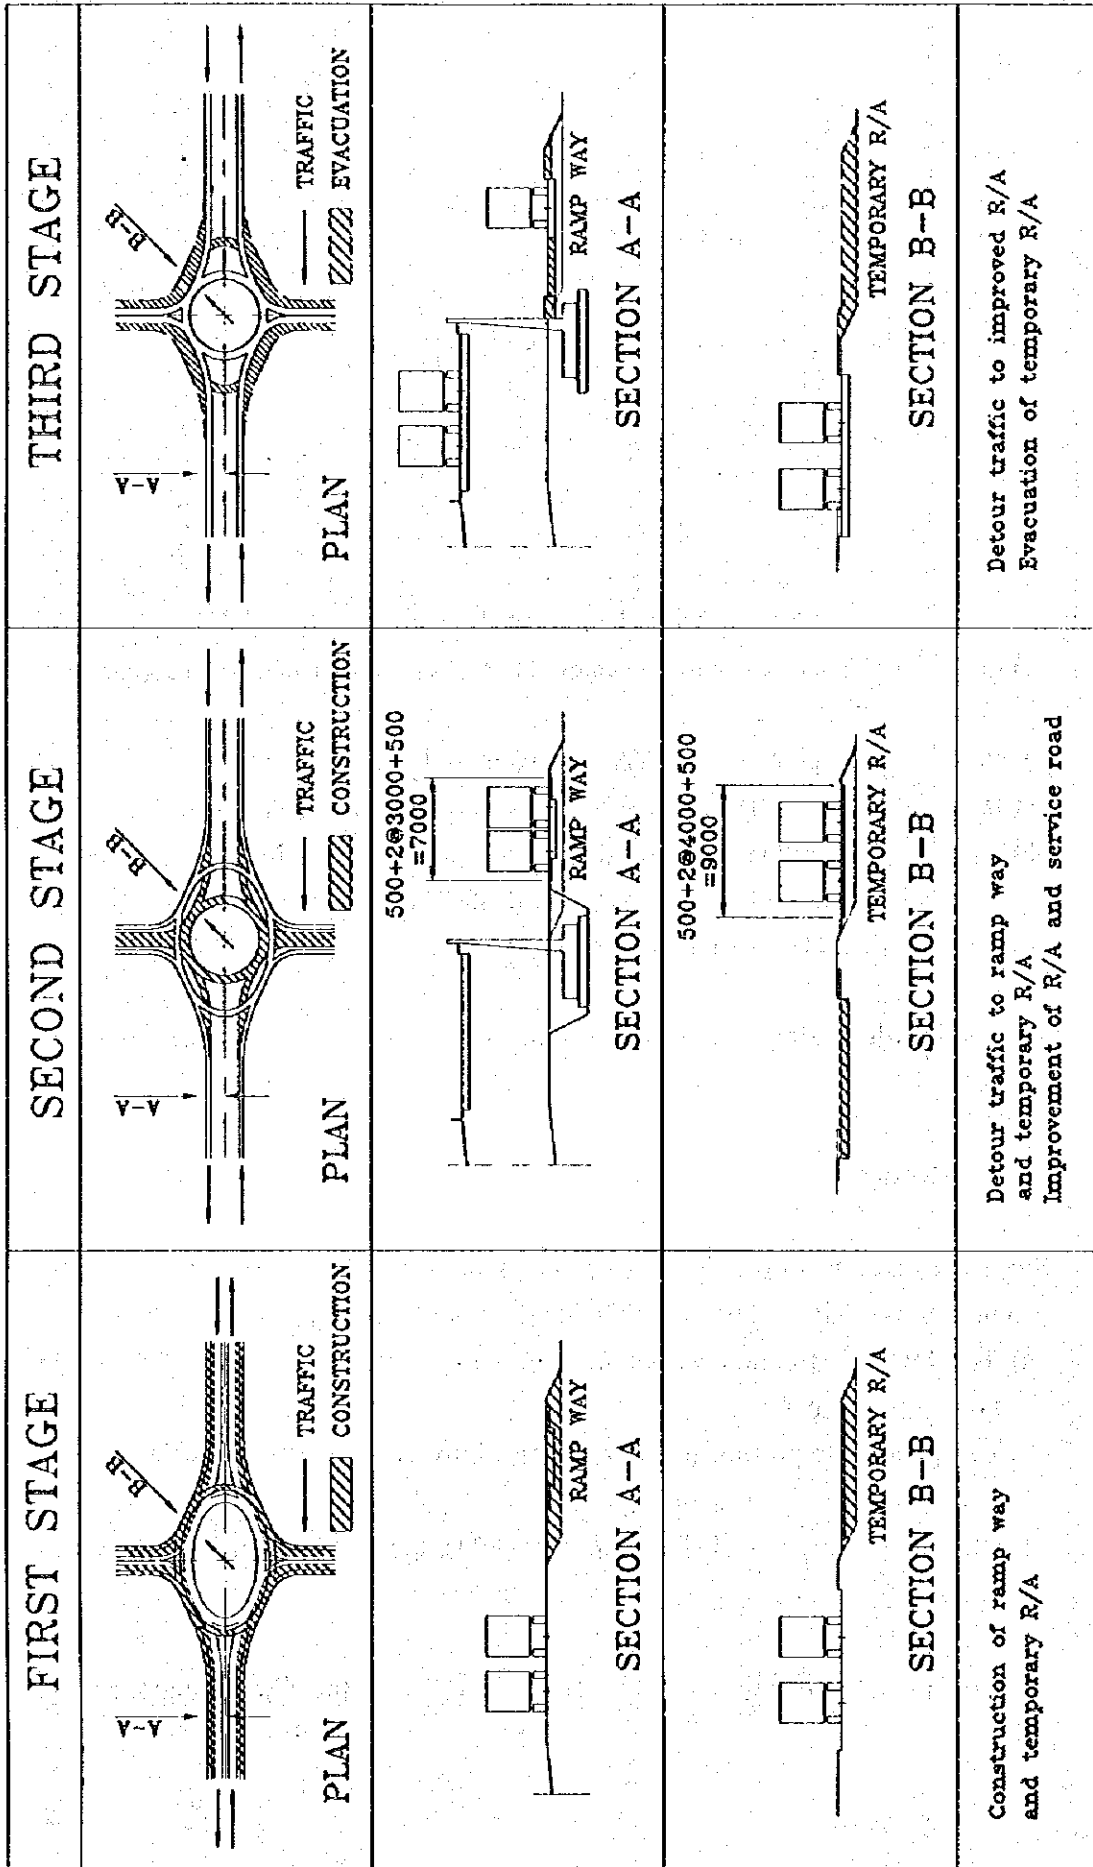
Detour Plan for F/O Construction (with R/A improvement)
